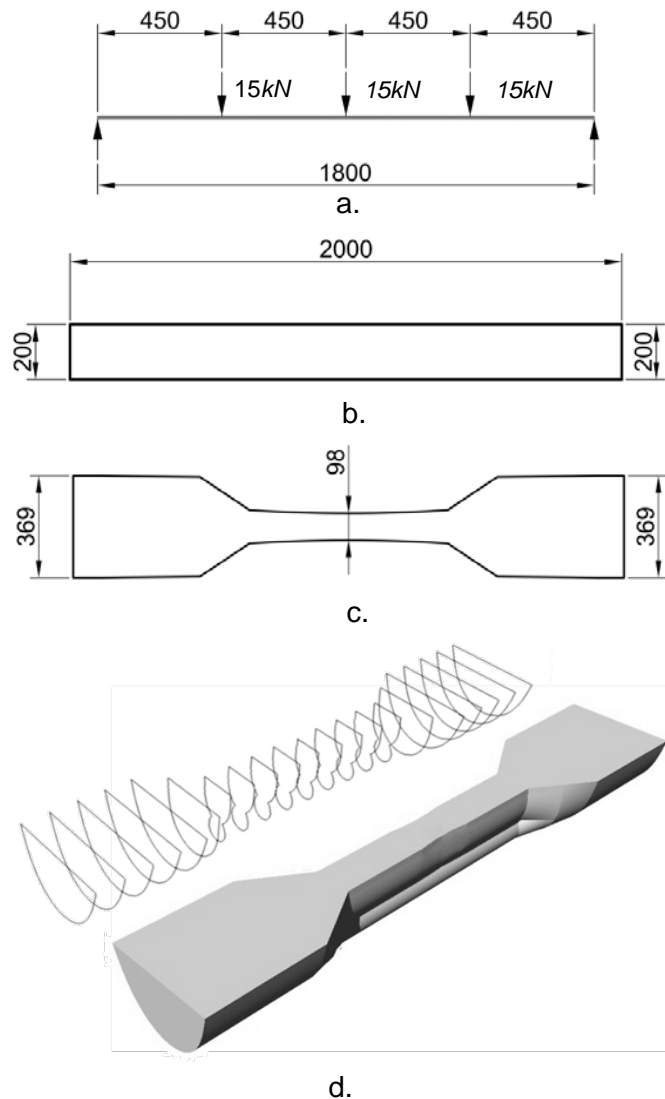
Beam FFB 5 geometry details: (a) loading arrangement, (b) elevation, (c) plan and (d) perspective view (all dimensions are in mm)
